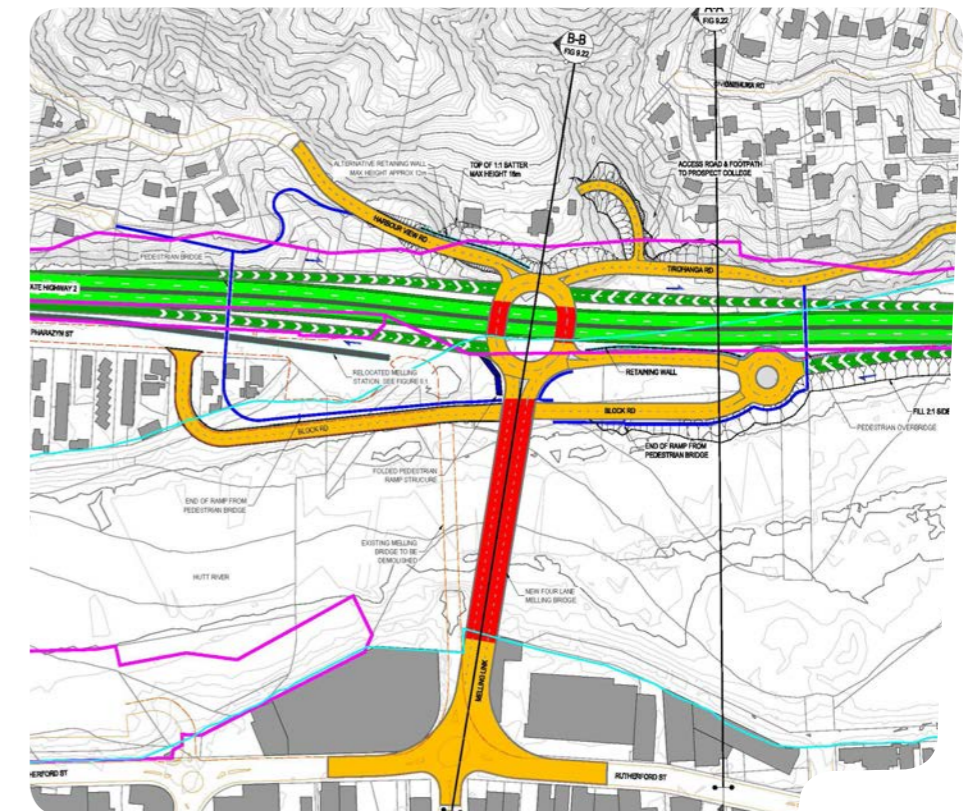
Melling intersection scheme design with grade separated highway and local road and replacement bridge
